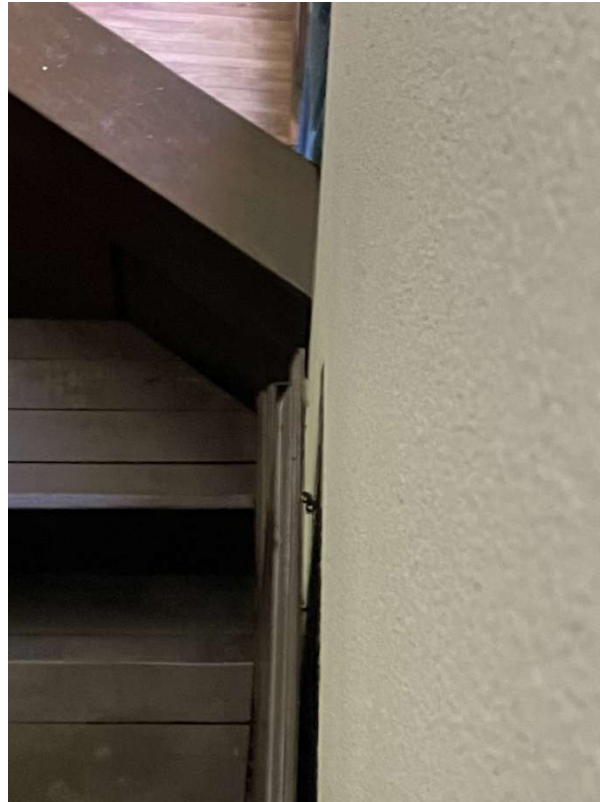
Second Floor – Balcony Connection at Rear Wall Separating
